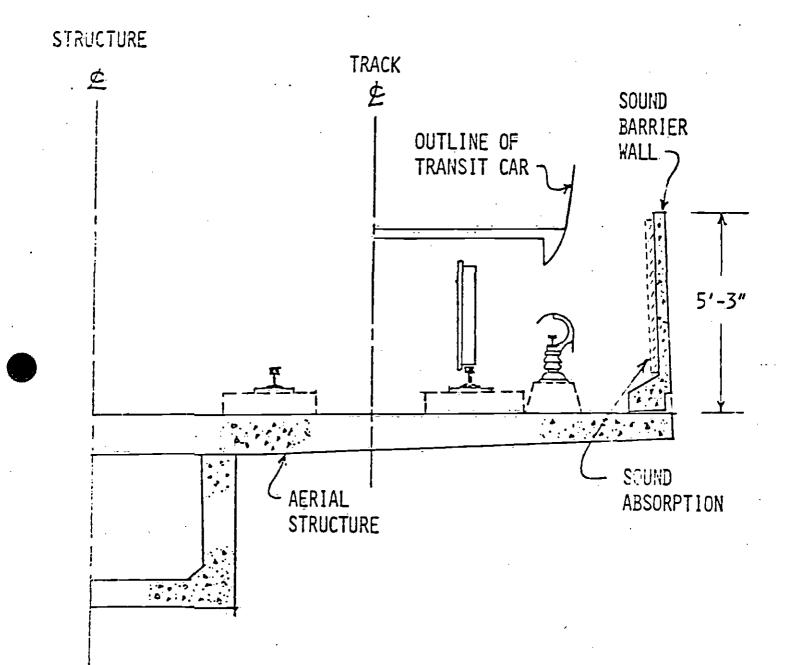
CROSS-SECTION OF MARTA AERIAL STRUCTURE SHOWING THE CONFIGURATION FOR SOUND BARRIER WALLS
